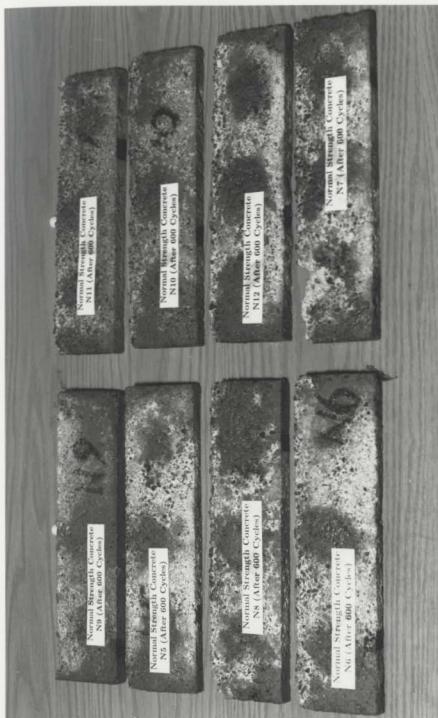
Thin direct tension normal strength concrete specimens (20 × 75 × 300 mm) after 600 cycles
